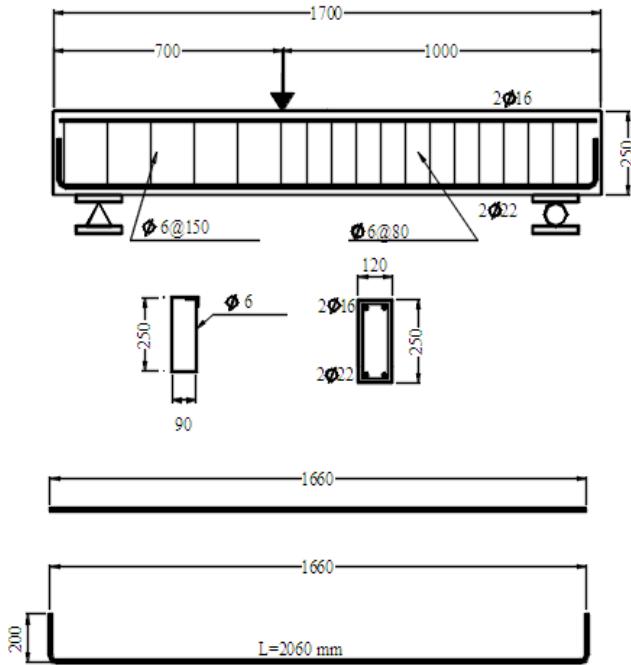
Typical beam reinforcement details (all dimensions are in mm).
